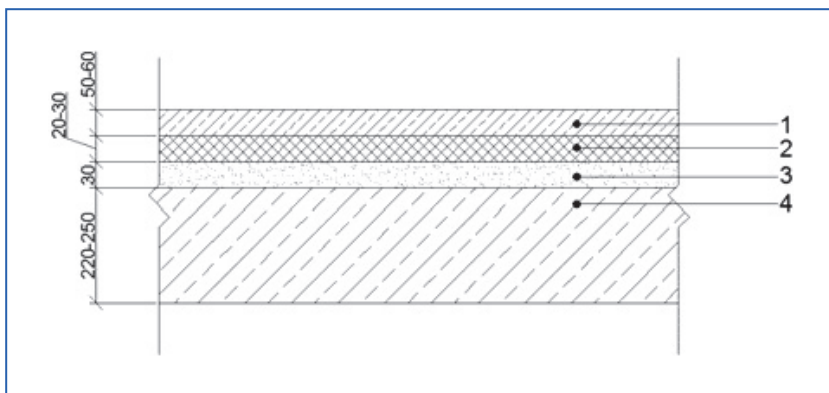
Floor construction "VI-type". 1) sand/cement screed, 2) mineral wool, 3) sand, 4) reinforced monolithic concrete slab.
